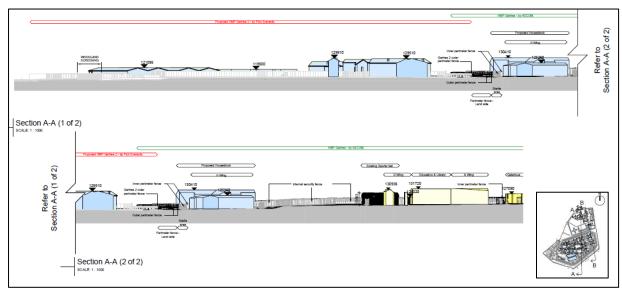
Cross Section AA through the proposed site and the existing HMP Gartree submitted with 21/01600/OUT
